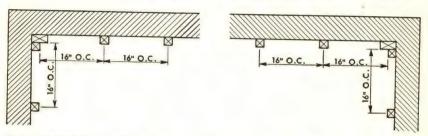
Typical Interior Corner Furring of SCR Brick Using a 2" x 4" and a 2" x 2". The Center of the First Furring Strip Away from the Corner in One Direction Should Be 16". Plus the Thickness of the Lath or Wallboard to Be Used
